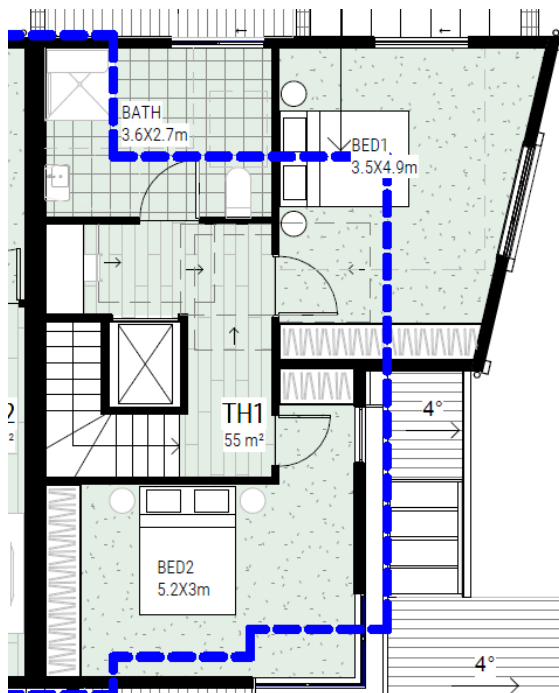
excerpt of the first floor plan showing that the proposed passenger lift is appropriately located to achieve access within the dwelling
